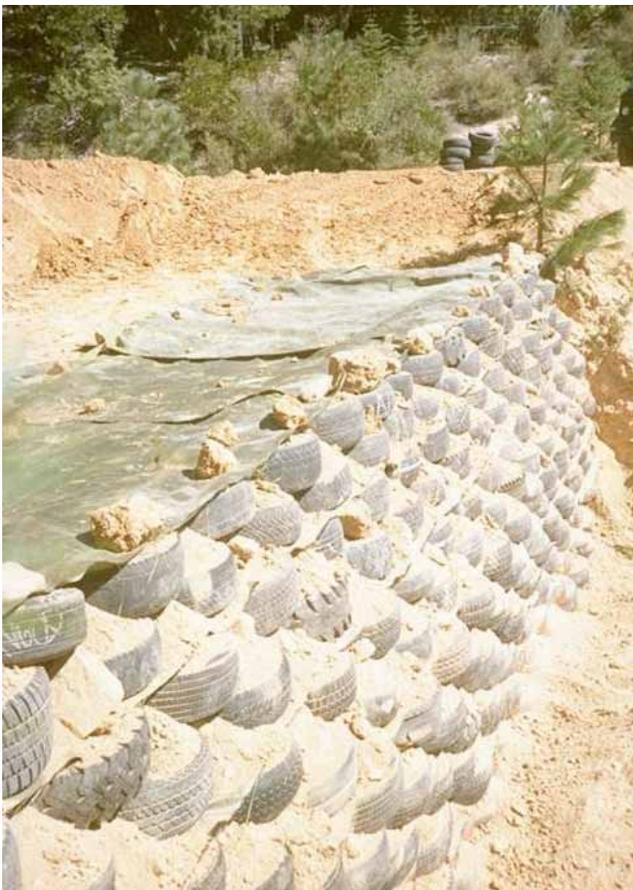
Tire wall and construction (Courtesy: G. Keller).
